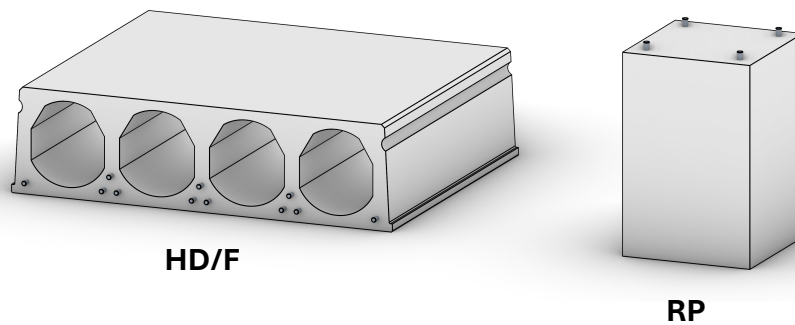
Common concrete profiles used as structural members in building construction in Sweden. A pre-stressed hollow-core slab element (HD/F) to the left and a rectangular column (RP) to the right.
